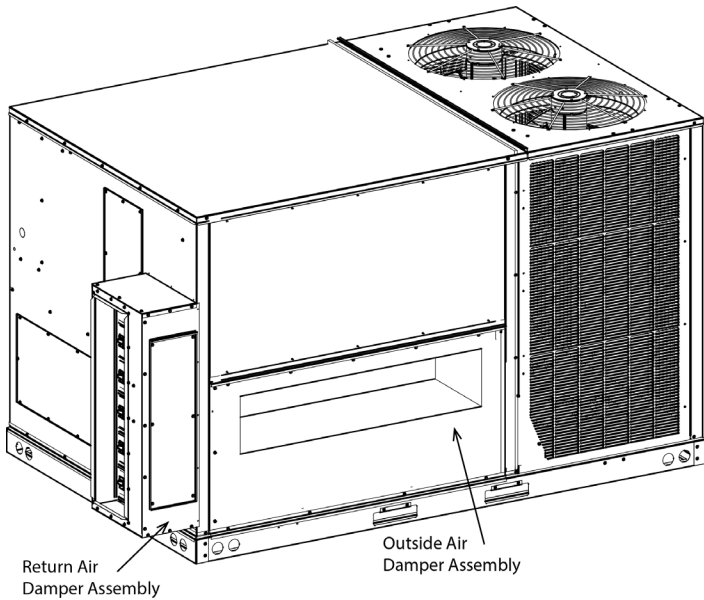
MEDIUM DAMPER ASSEMBLIES
